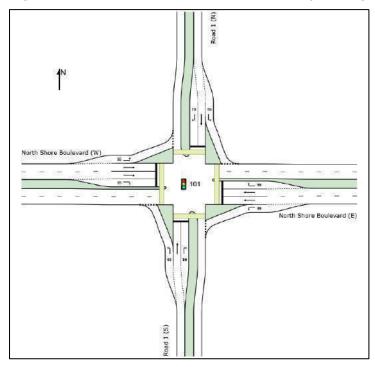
North Shore Boulevard / Road 1 | Ultimate SIDRA Layout
